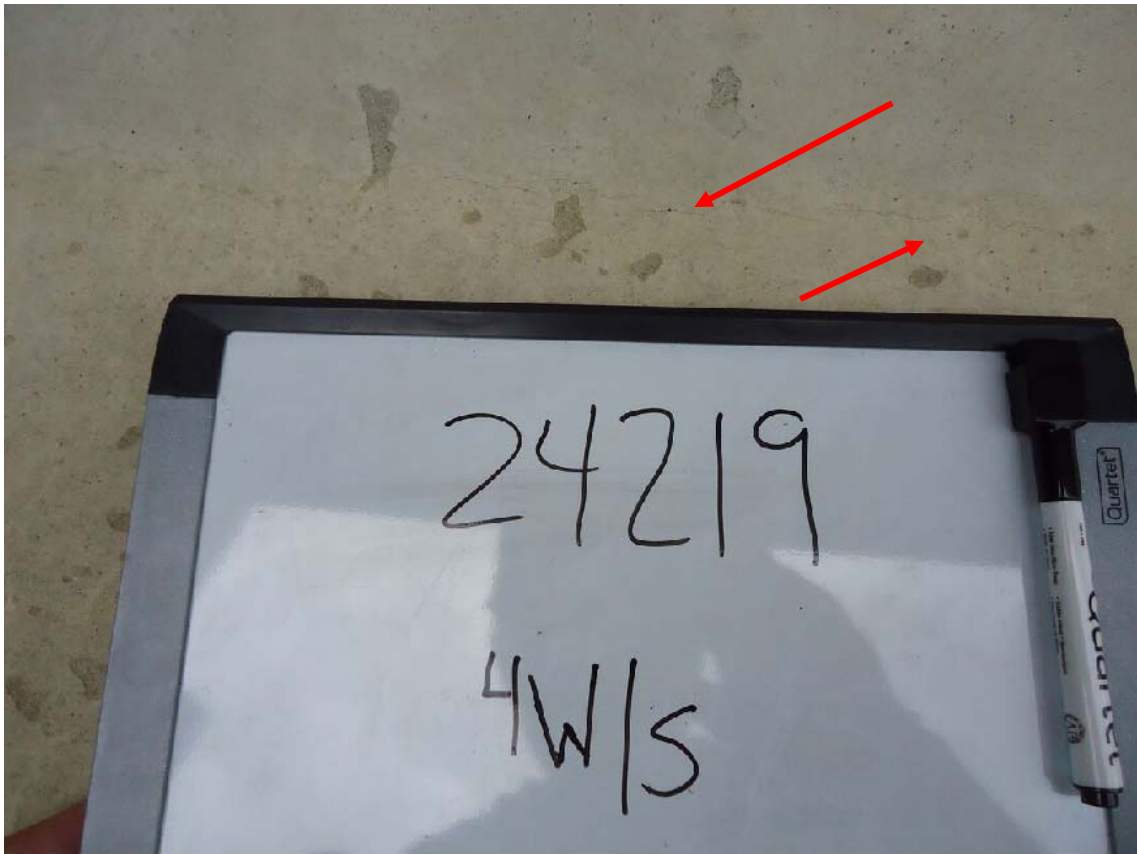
Horizontal Crack at Flange/Web Interface⁴(4W-S)
